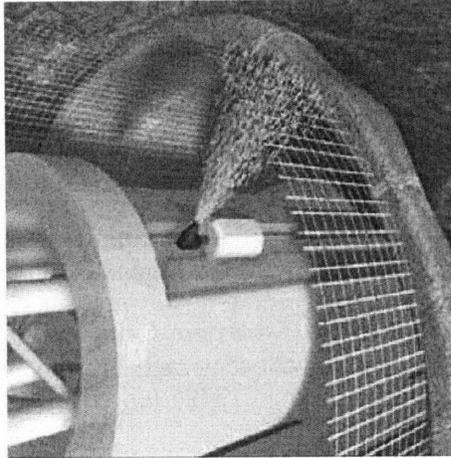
, Shotcrete Application, (Kolymbas 2005)
